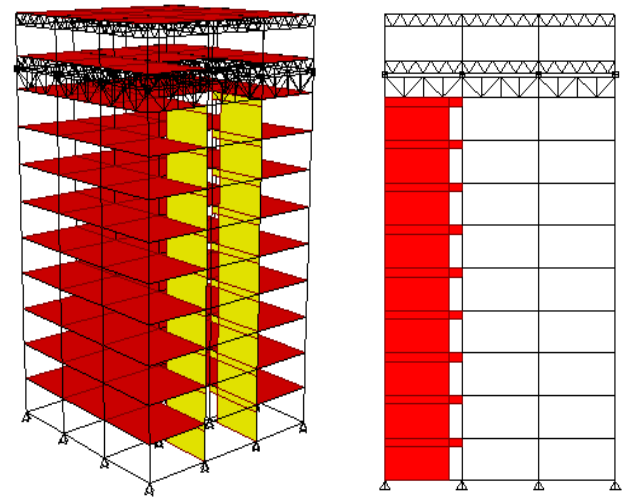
DESIGN MODEL OF 9-STORY BUILDING PROTECTED BY AIUF
